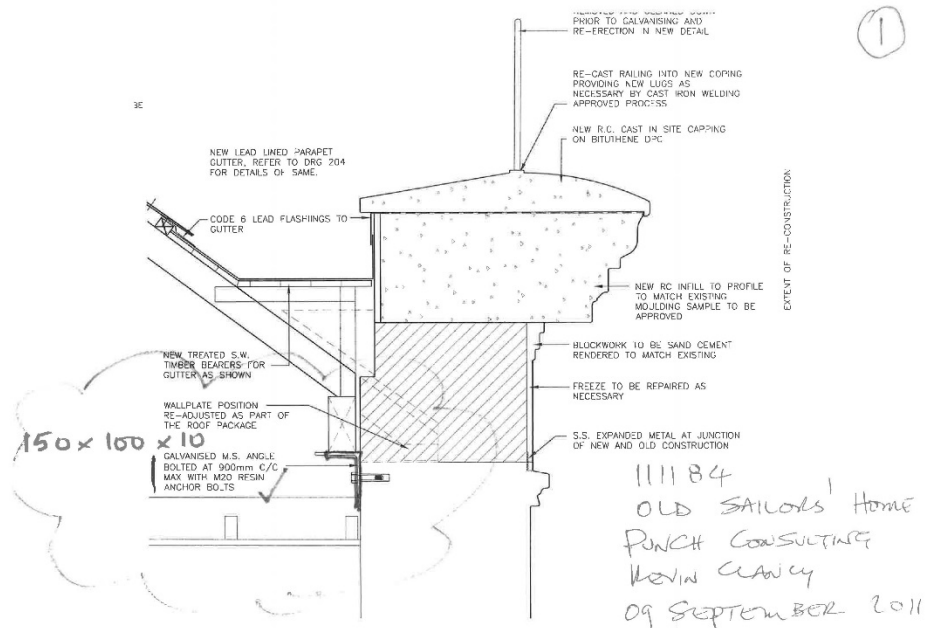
Design sketches for repairs to lead gutters and parapet walls.
